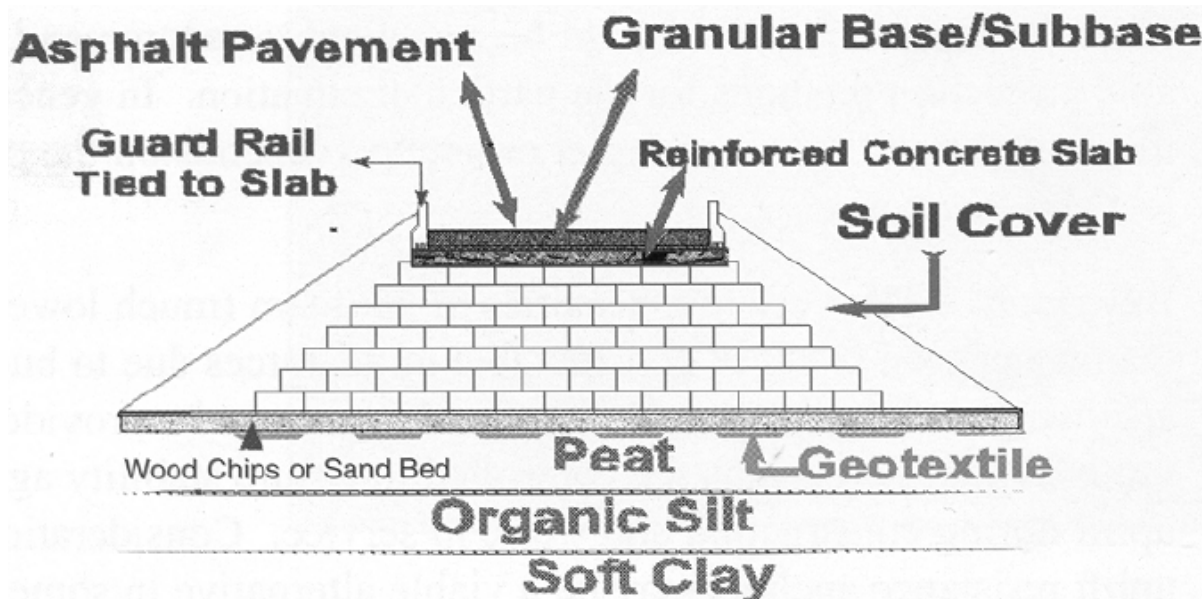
Typical Construction Detail for EPS GeoFoam Embankment (from Negussey 1997).
